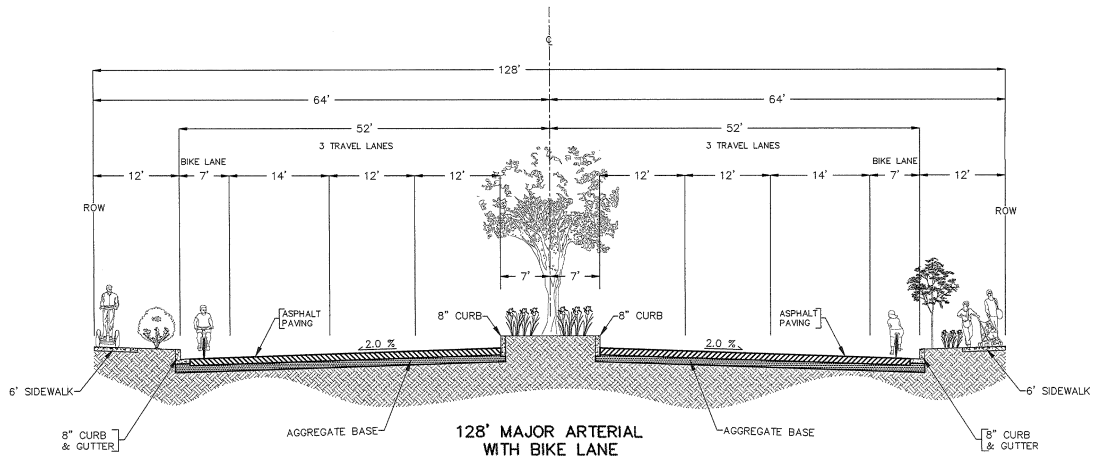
(1of3): CITY OF HESPERIA GENERAL PLAN ROADWAY CROSS-SECTIONS
